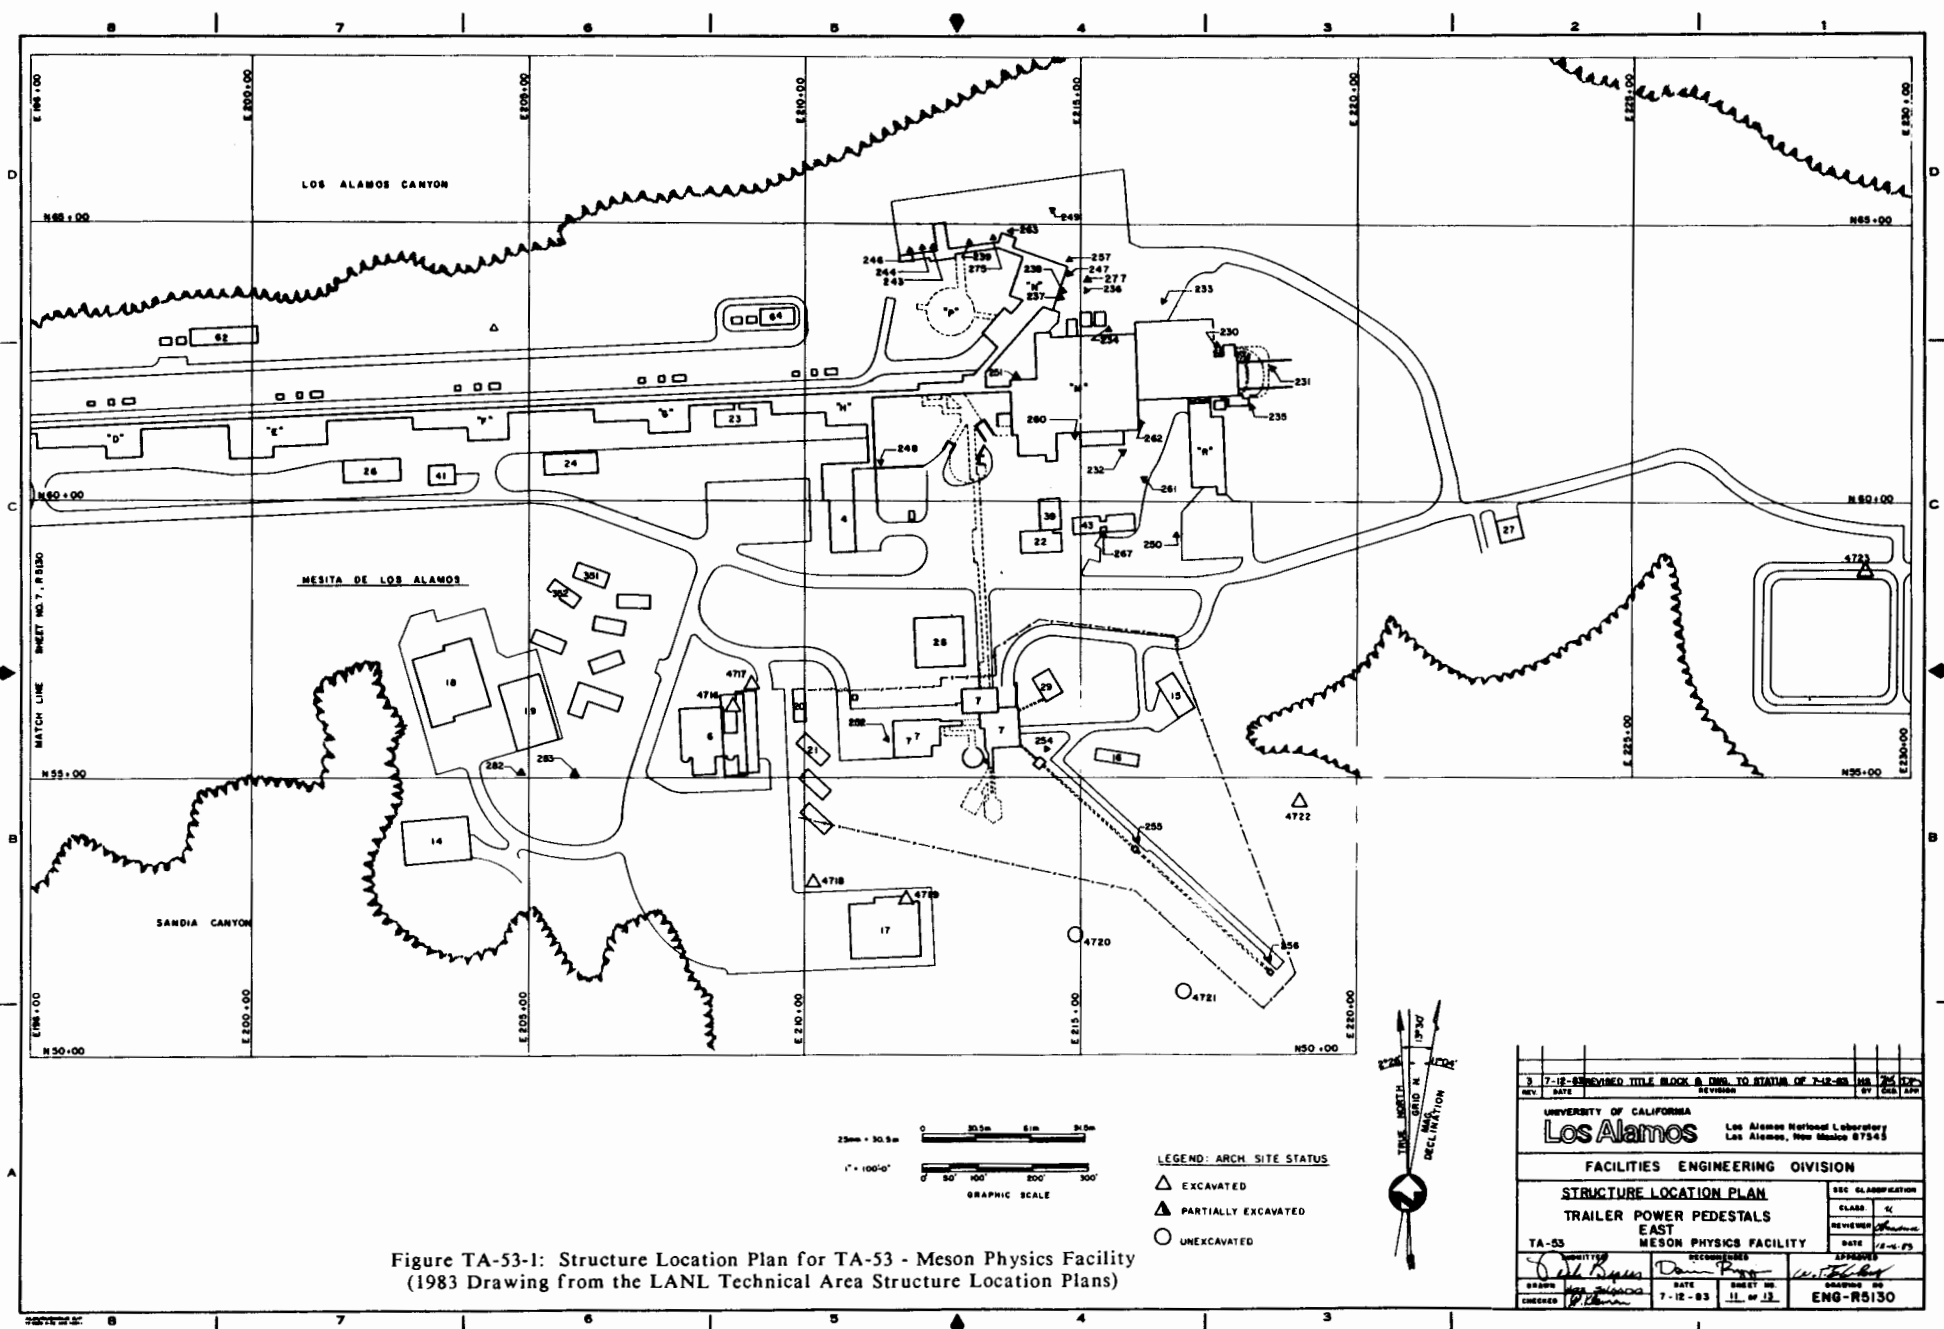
Structure Location Plan for TA-53 - Meson Physics Facility (1983 Drawing from the LANL Technical Area Structure Location Plans)
